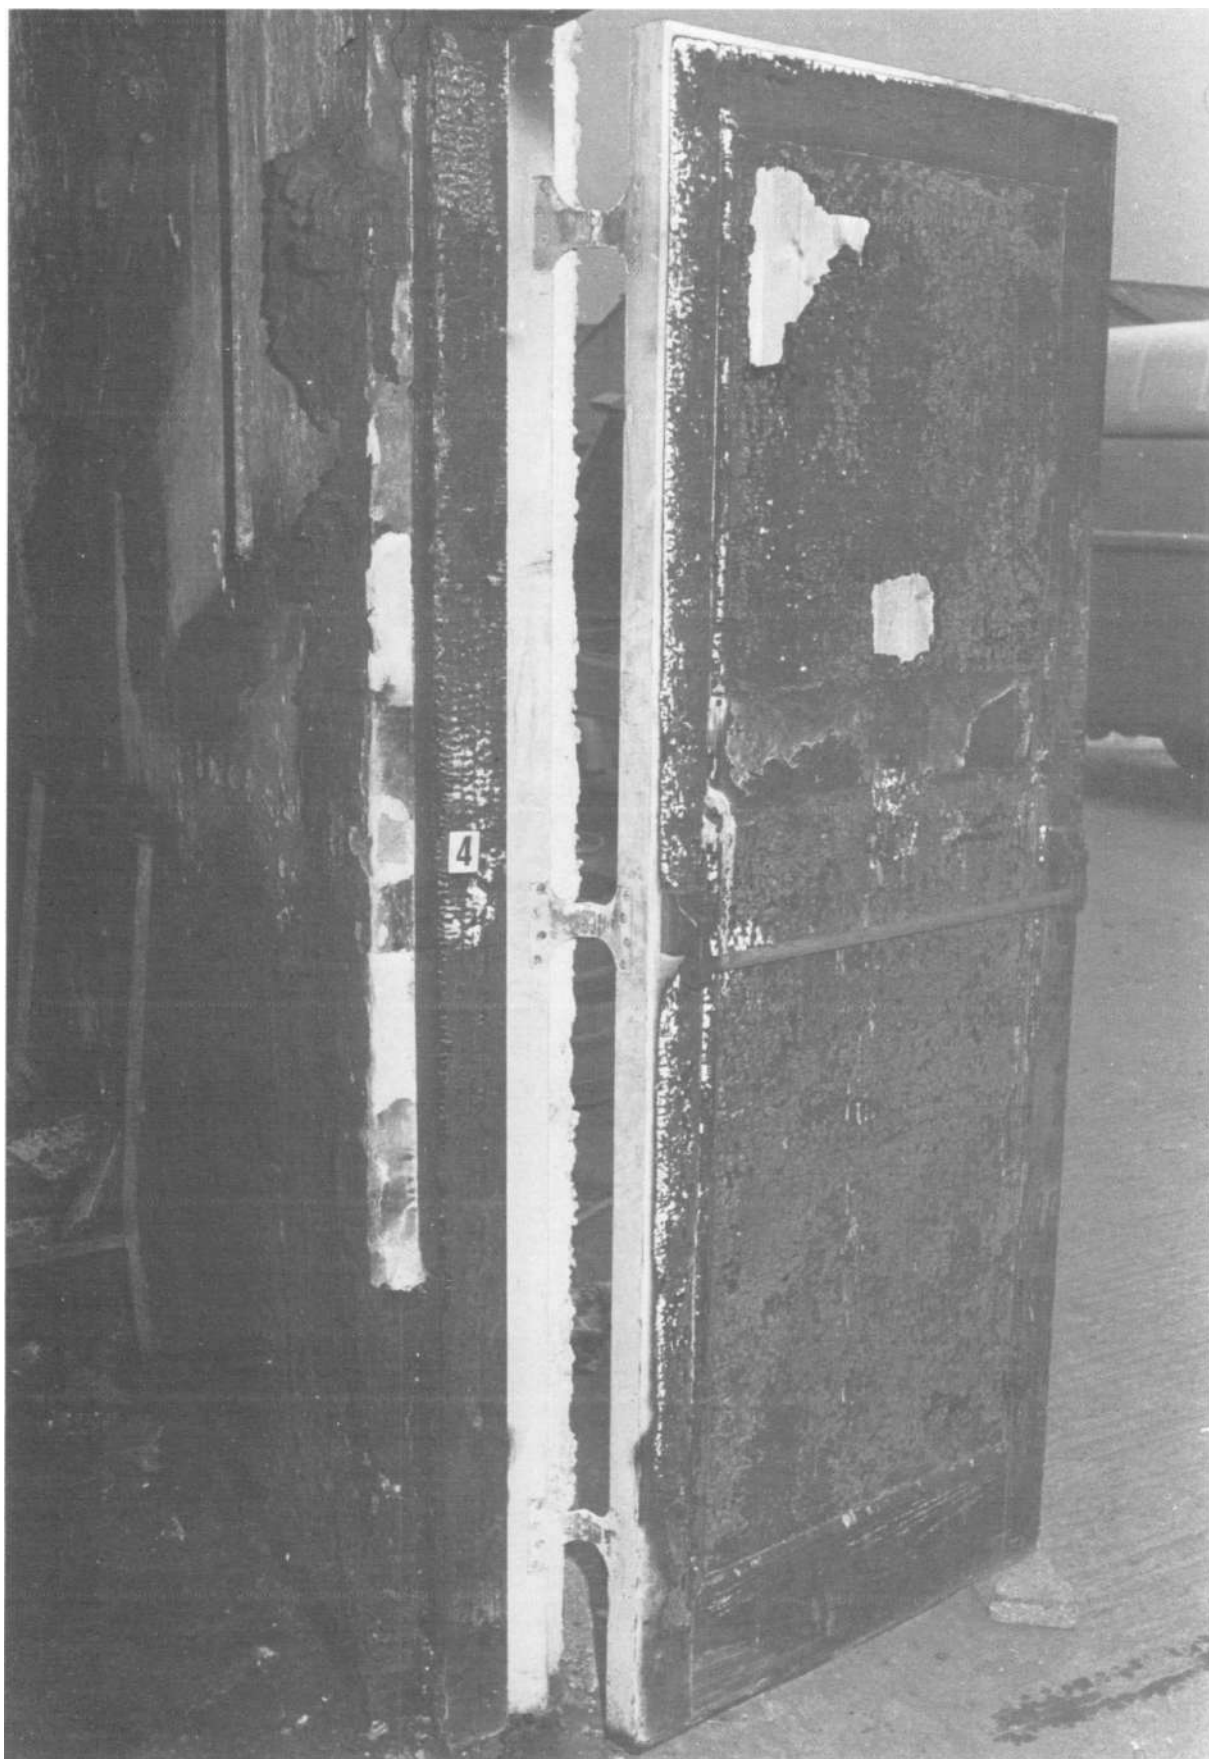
View of left-hand door and frame of Exit 4; note edges of door and frame undamaged.
